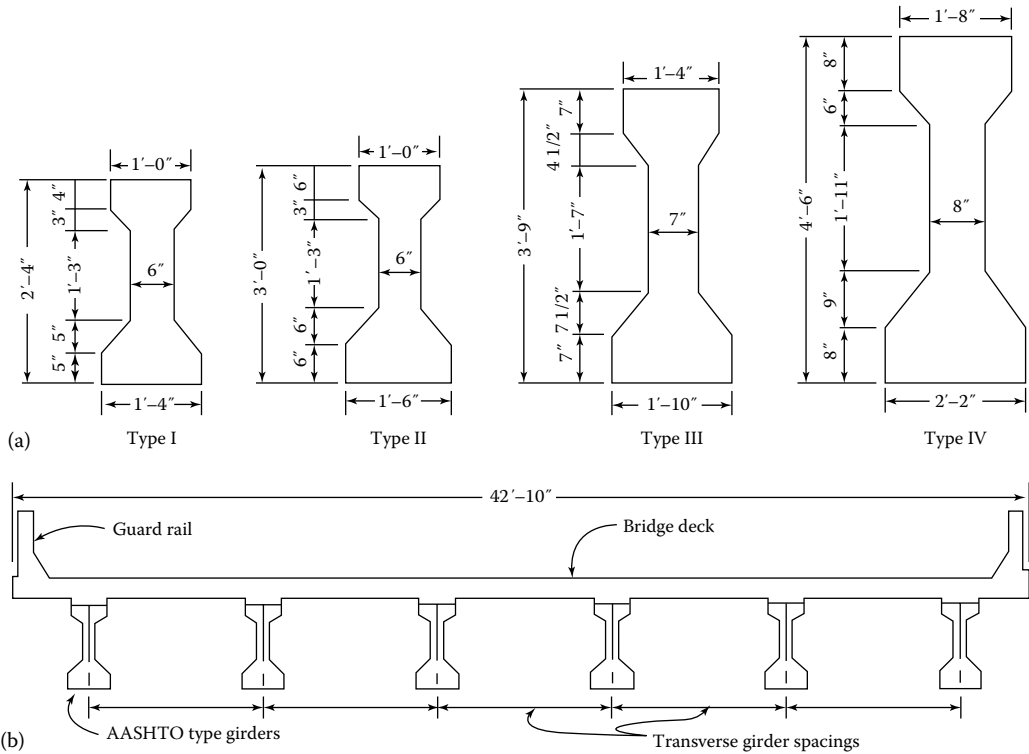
(a) Typical standardized prestressed concrete I-shaped girders, (b) cross section of a superstructure system *Type k*: RC deck supported on prestressed concrete I-beams (shown) or bulb-T girders (not shown). The deck is designed to act compositely with the supporting girders. The dimensions shown are for illustrative purposes only.
